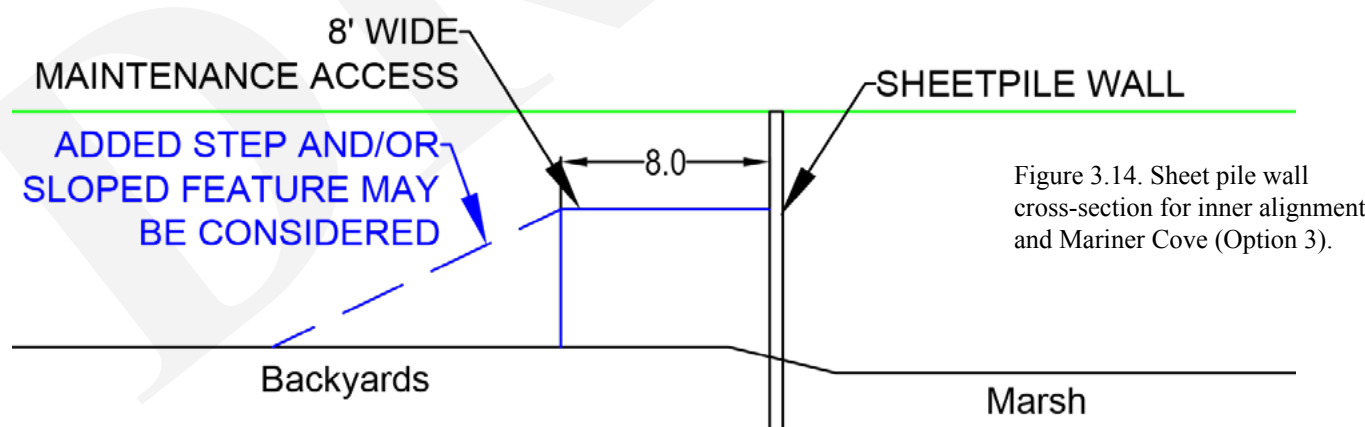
Sheet pile wall cross-section for inner alignment and Mariner Cove (Option 3).
